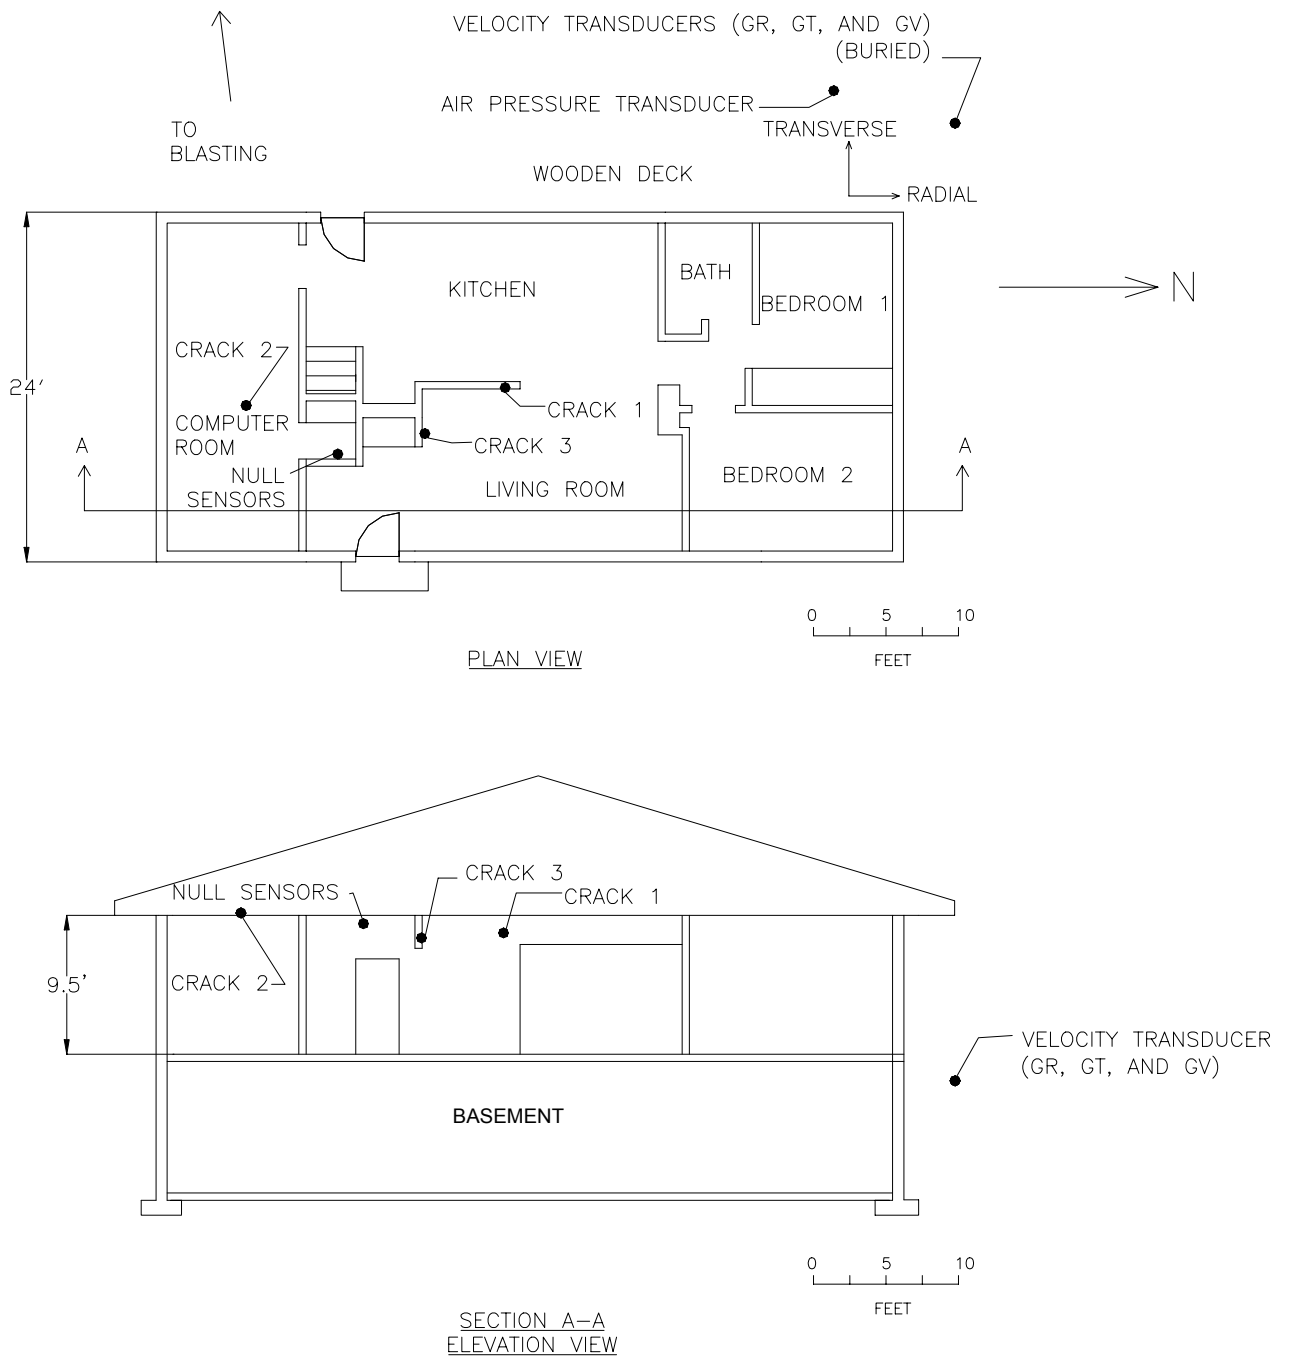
Plan view and elevation view of Wisconsin concrete block house
